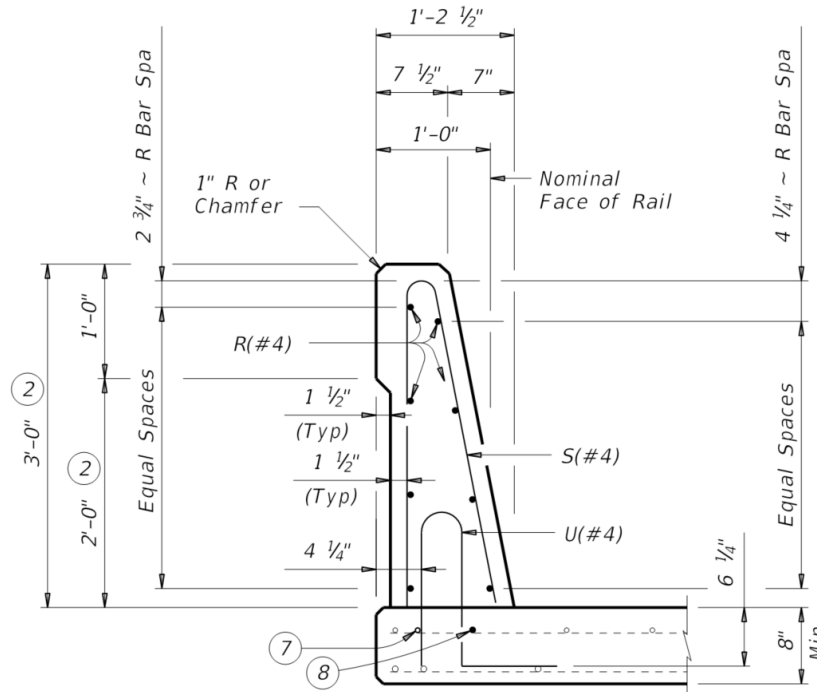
Texas DOT single slope traffic railing (SSTR) standard details
